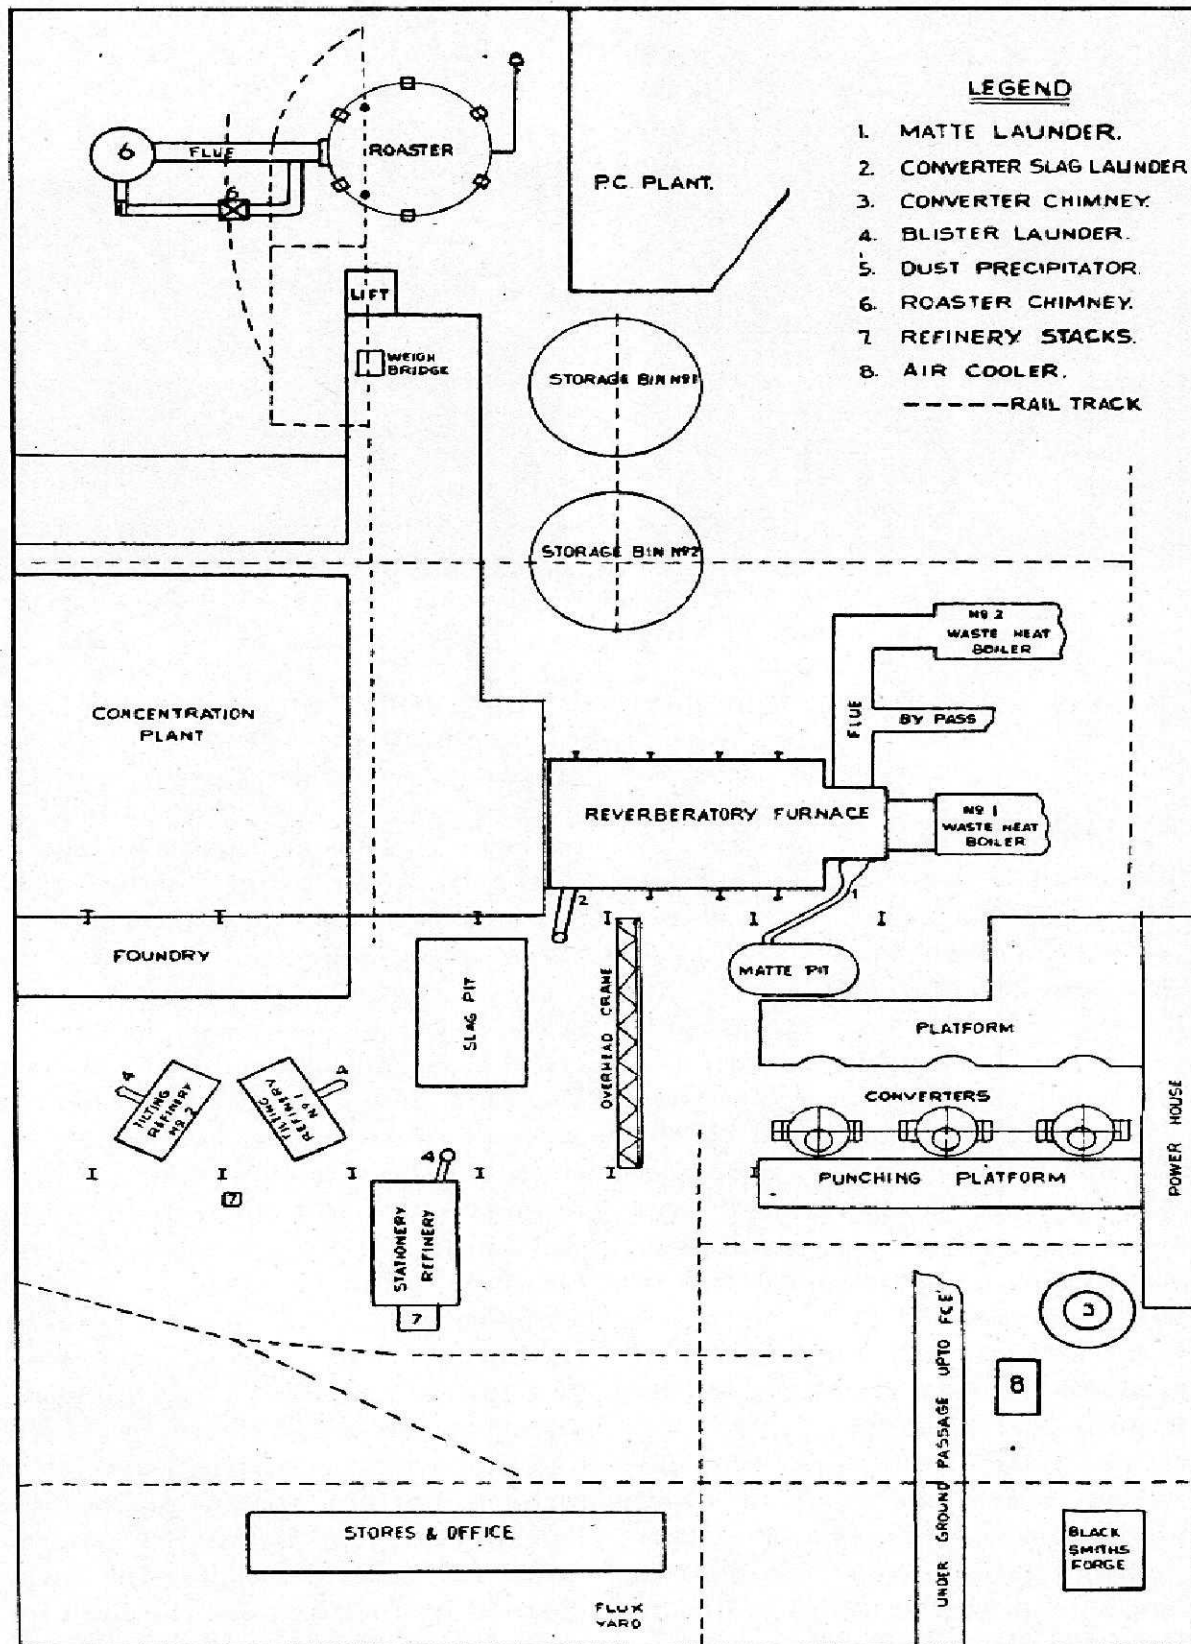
LAYOUT PLAN OF SMELTER EQUIPMENT
